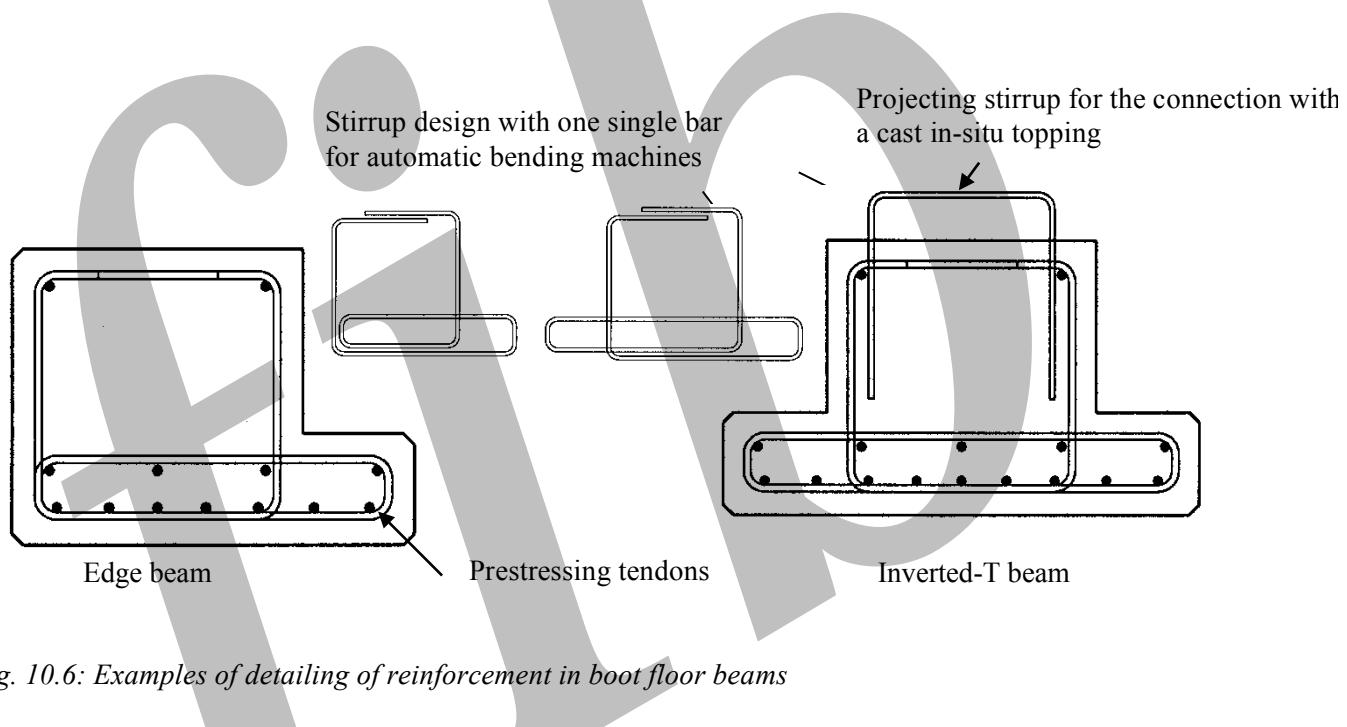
Examples of detailing of reinforcement in boot floor beams
